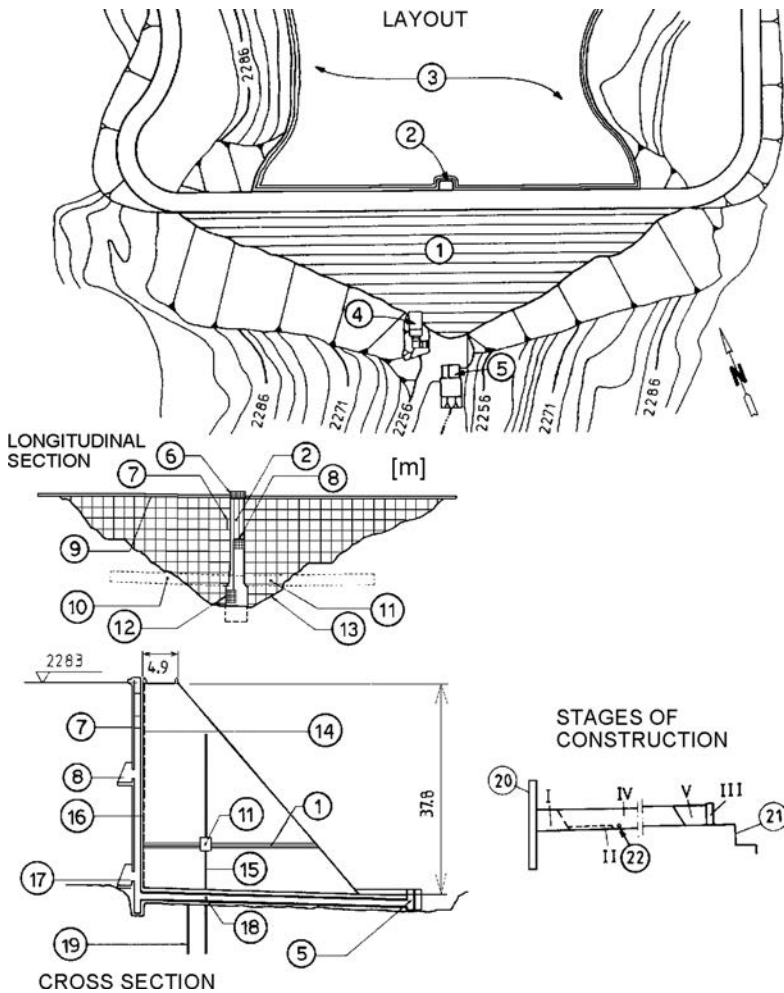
Middle Fork dam (USA). (1) The dam's body of roller-compacted concrete; (2) overflow and outlet structure-inlet structure; (3) normal level; (4) approach towards drainage gallery; (5) outlet structure; (6) higher overflow and (7) lower overflow; (8) discharge outlet; (9) concrete fence; (10) drainage tunnel; (11) drainage gallery; (12) discharge outlet in the course of construction; (13) layout plan of dam; (14) stoppage of concreting due to drilling; (15) drainage drill holes; (16) upstream face; (17) entrance for offtake of construction waters; (18) overflow and discharge outlet pipes; (19) grout curtain; (20) formwork at the upstream face; (21) step-like downstream slope; (22) drainage pipe. (I-V) Stages of construction.
